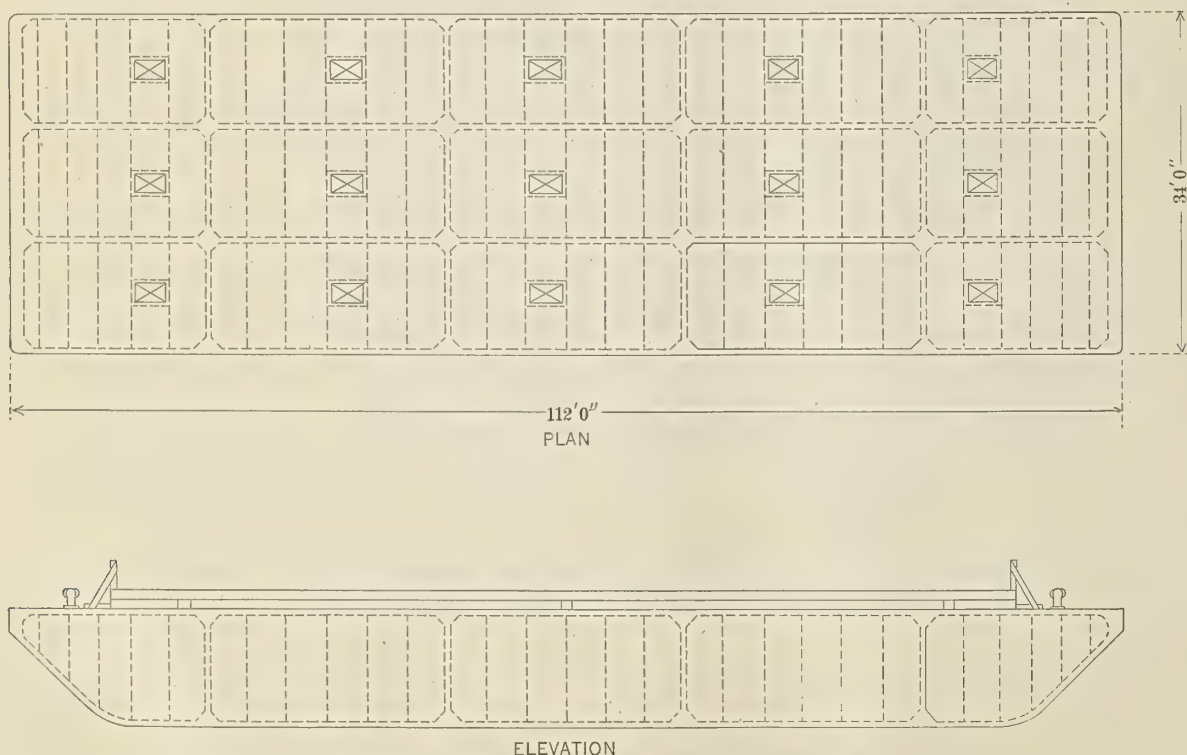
Plan and Elevation of Aberthaw Concrete Boat
